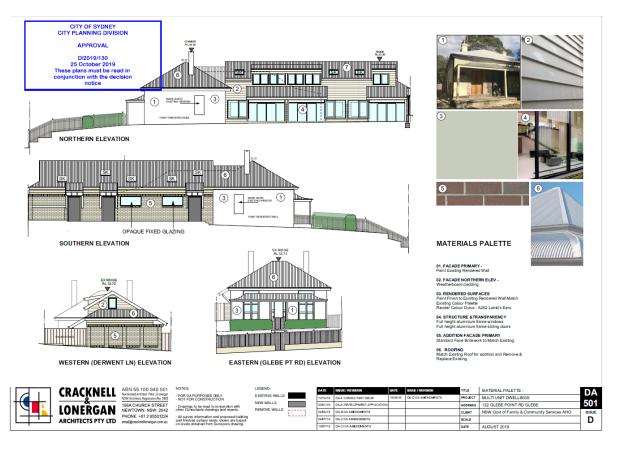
Approved plans from development approved in 2019 at No. 122 Glebe Point Road (and now constructed as shown in Figure 14)
